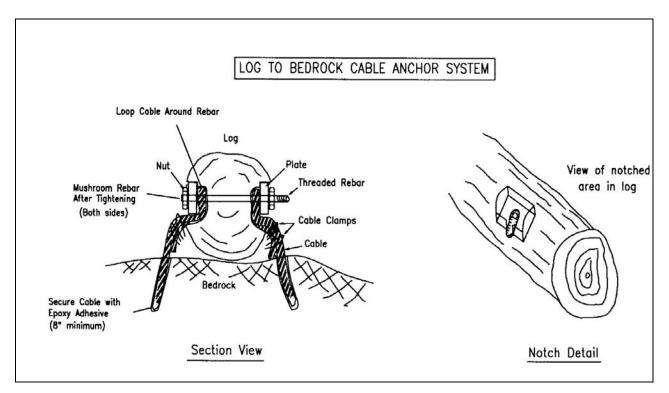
Threaded rebar and cable anchor to boulder or bedrock.
